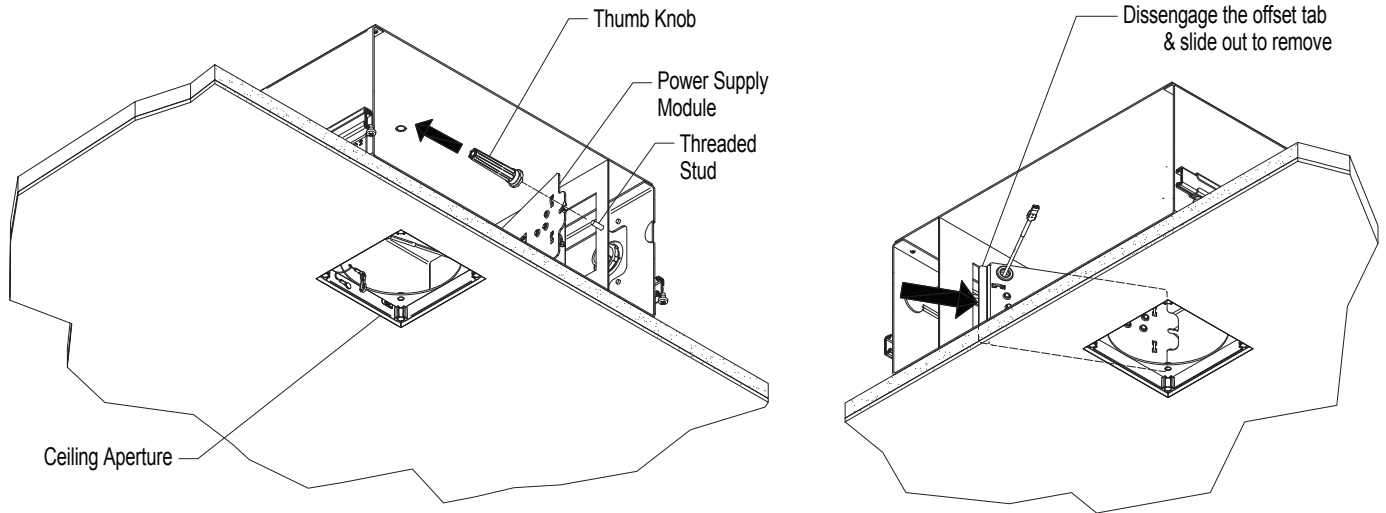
Remove Thumb Knob & Disengage Power Supply Module (Model 804 shown)
